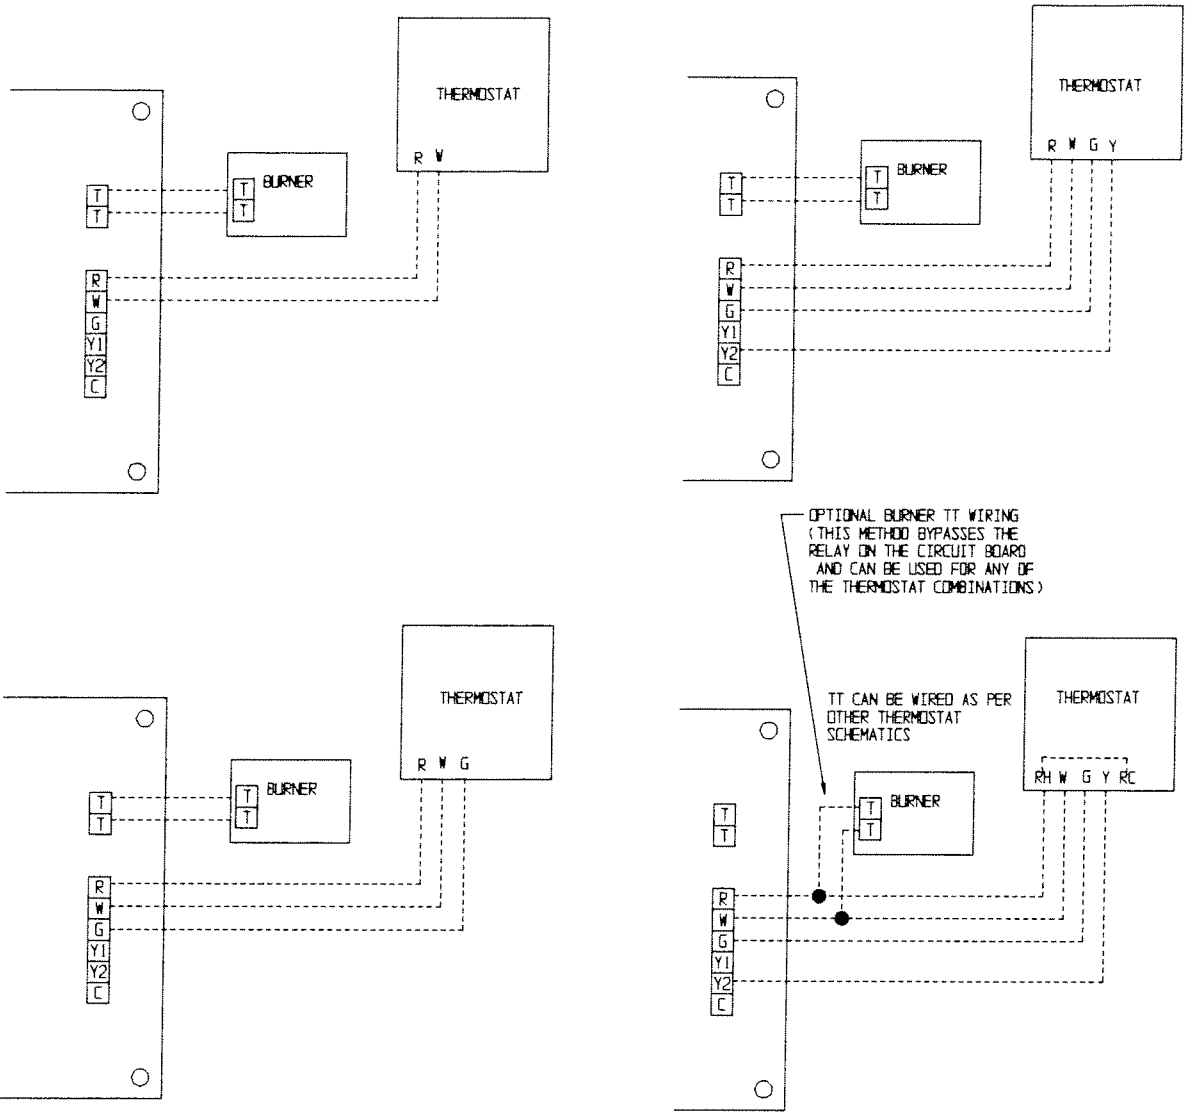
FURNACE WIRING SCHEMATIC - VSM MOTOR
